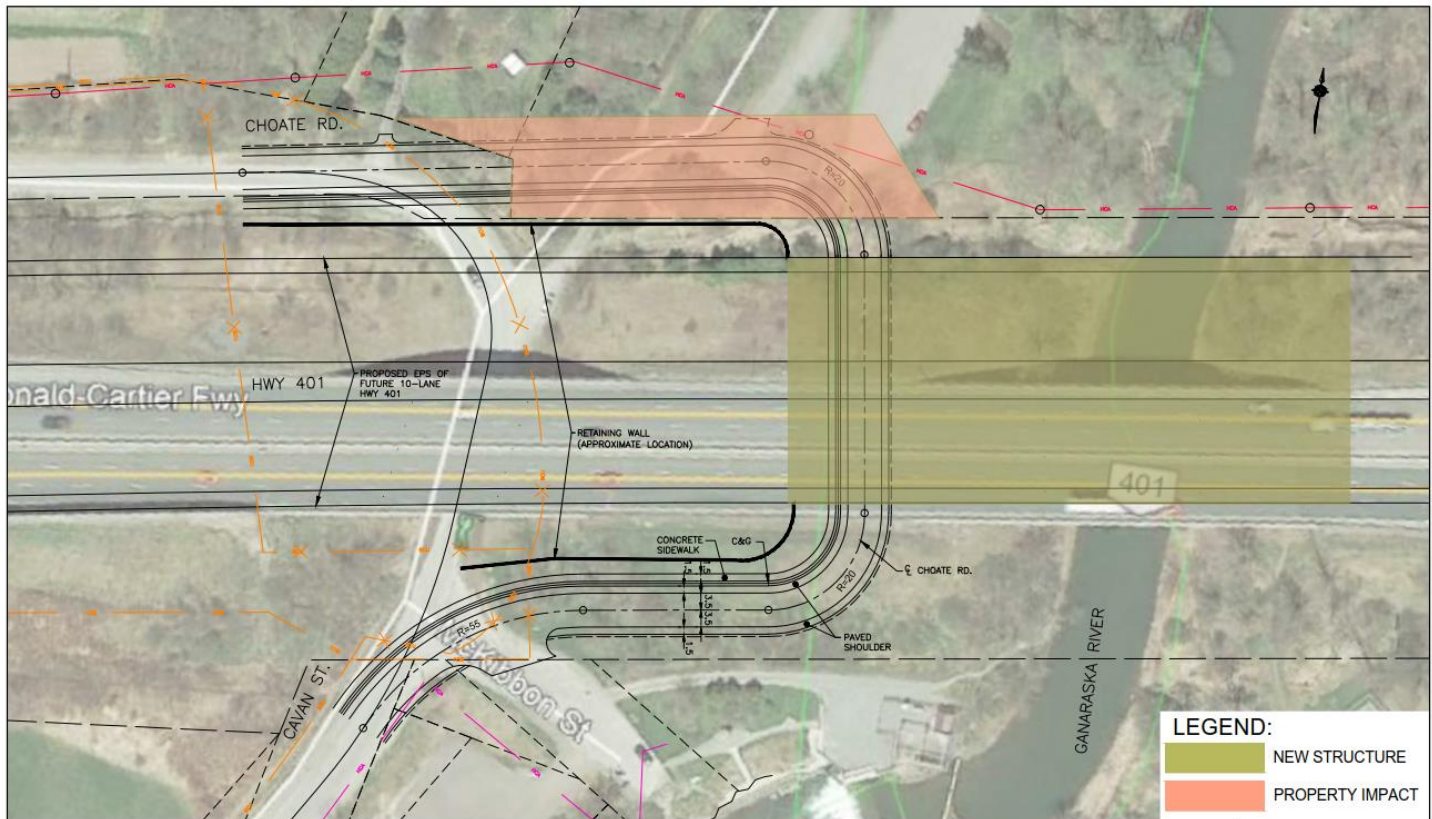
Choate Road and Ganaraska River bridges Alternative 3D
